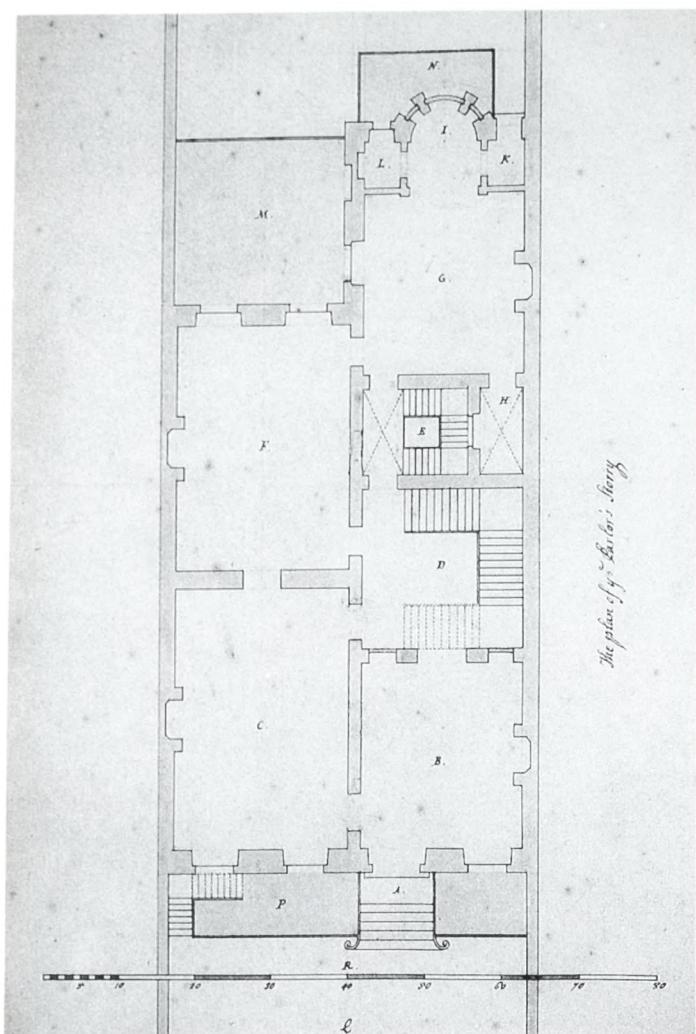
Plate XI, the plan of the ground floor (British Architectural Library).
